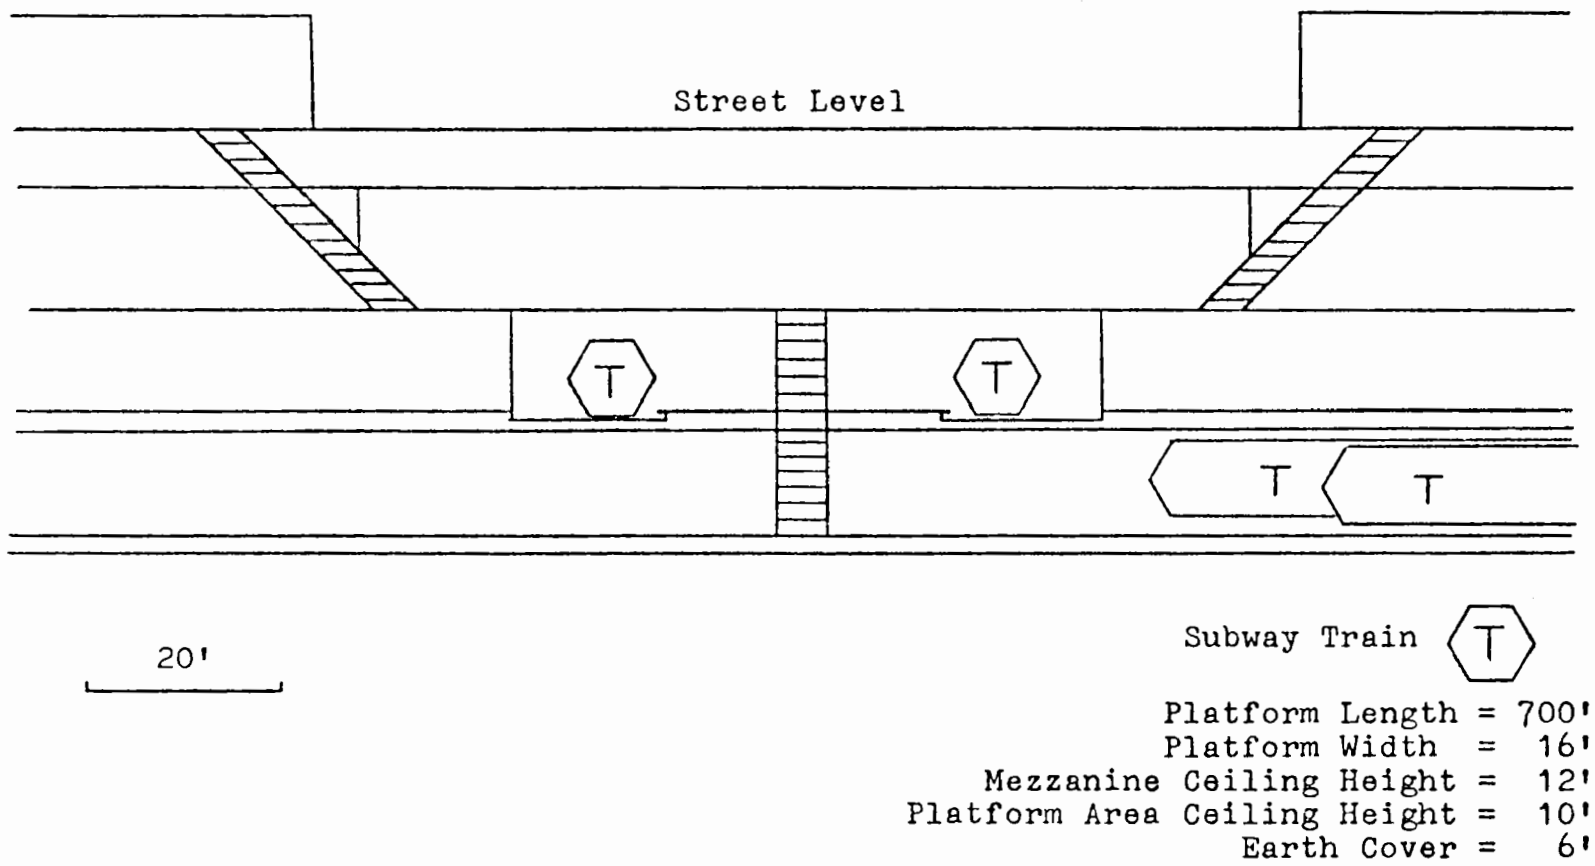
Alternative 5: Mezzanine Within Trainroom and Above Platform Level, Center Platforms
